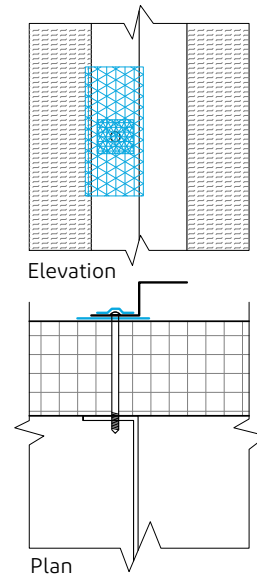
DuPont™ LiquidArmor™ Flashing and Sealant with Horizontal Z-Girt
